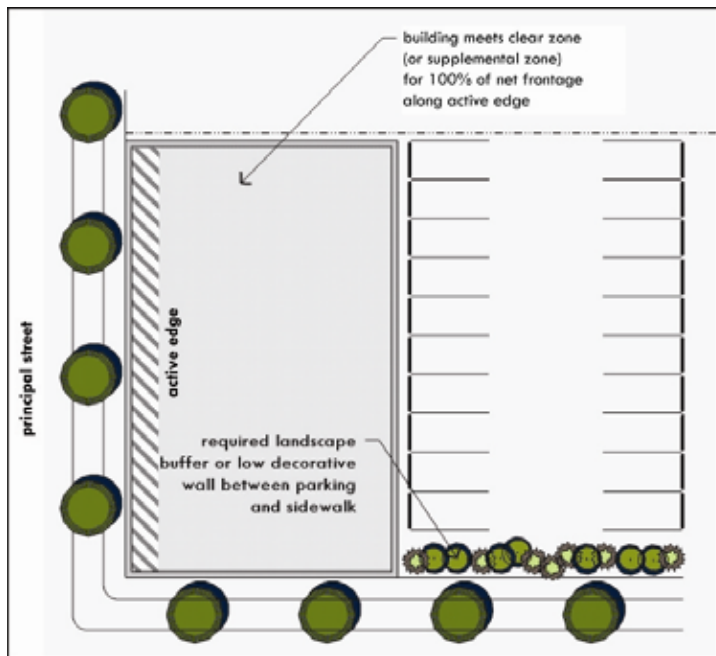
Building placement requirement along an active edge with required landscaping between parking and clear zone along other adjacent streets.
